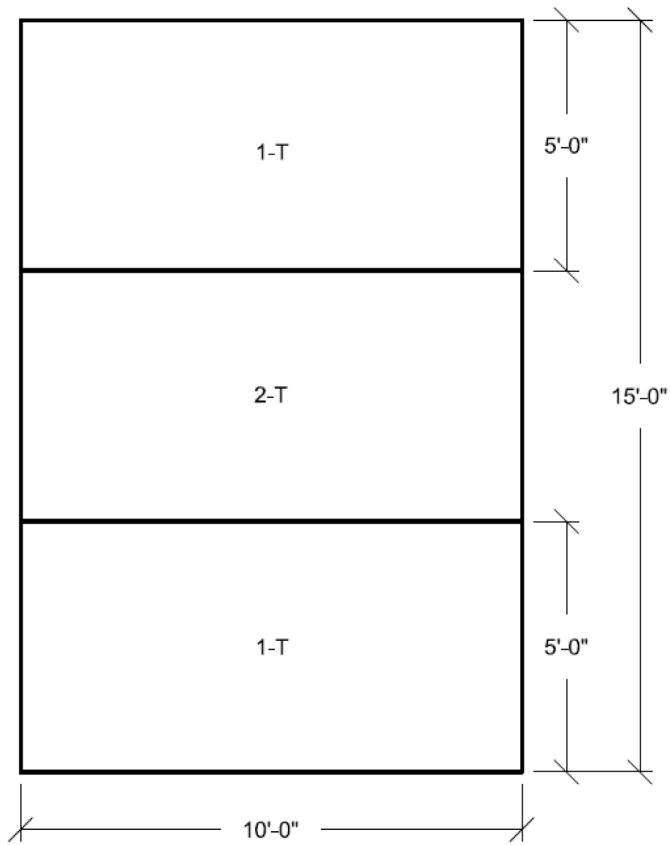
H.6-208 DGFOSV Wall 16 Looking From Outside Transverse Reinforcement Zones
